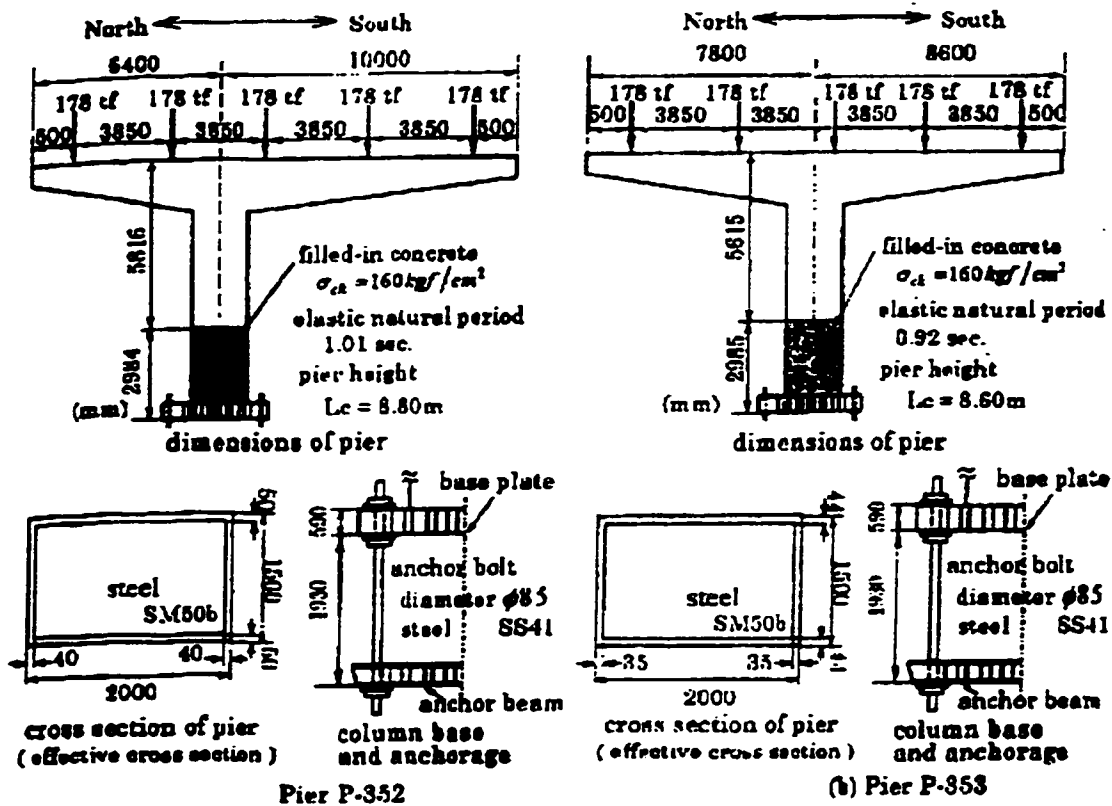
Structural dimensions of bridge piers [Goto et al. (1997)].
